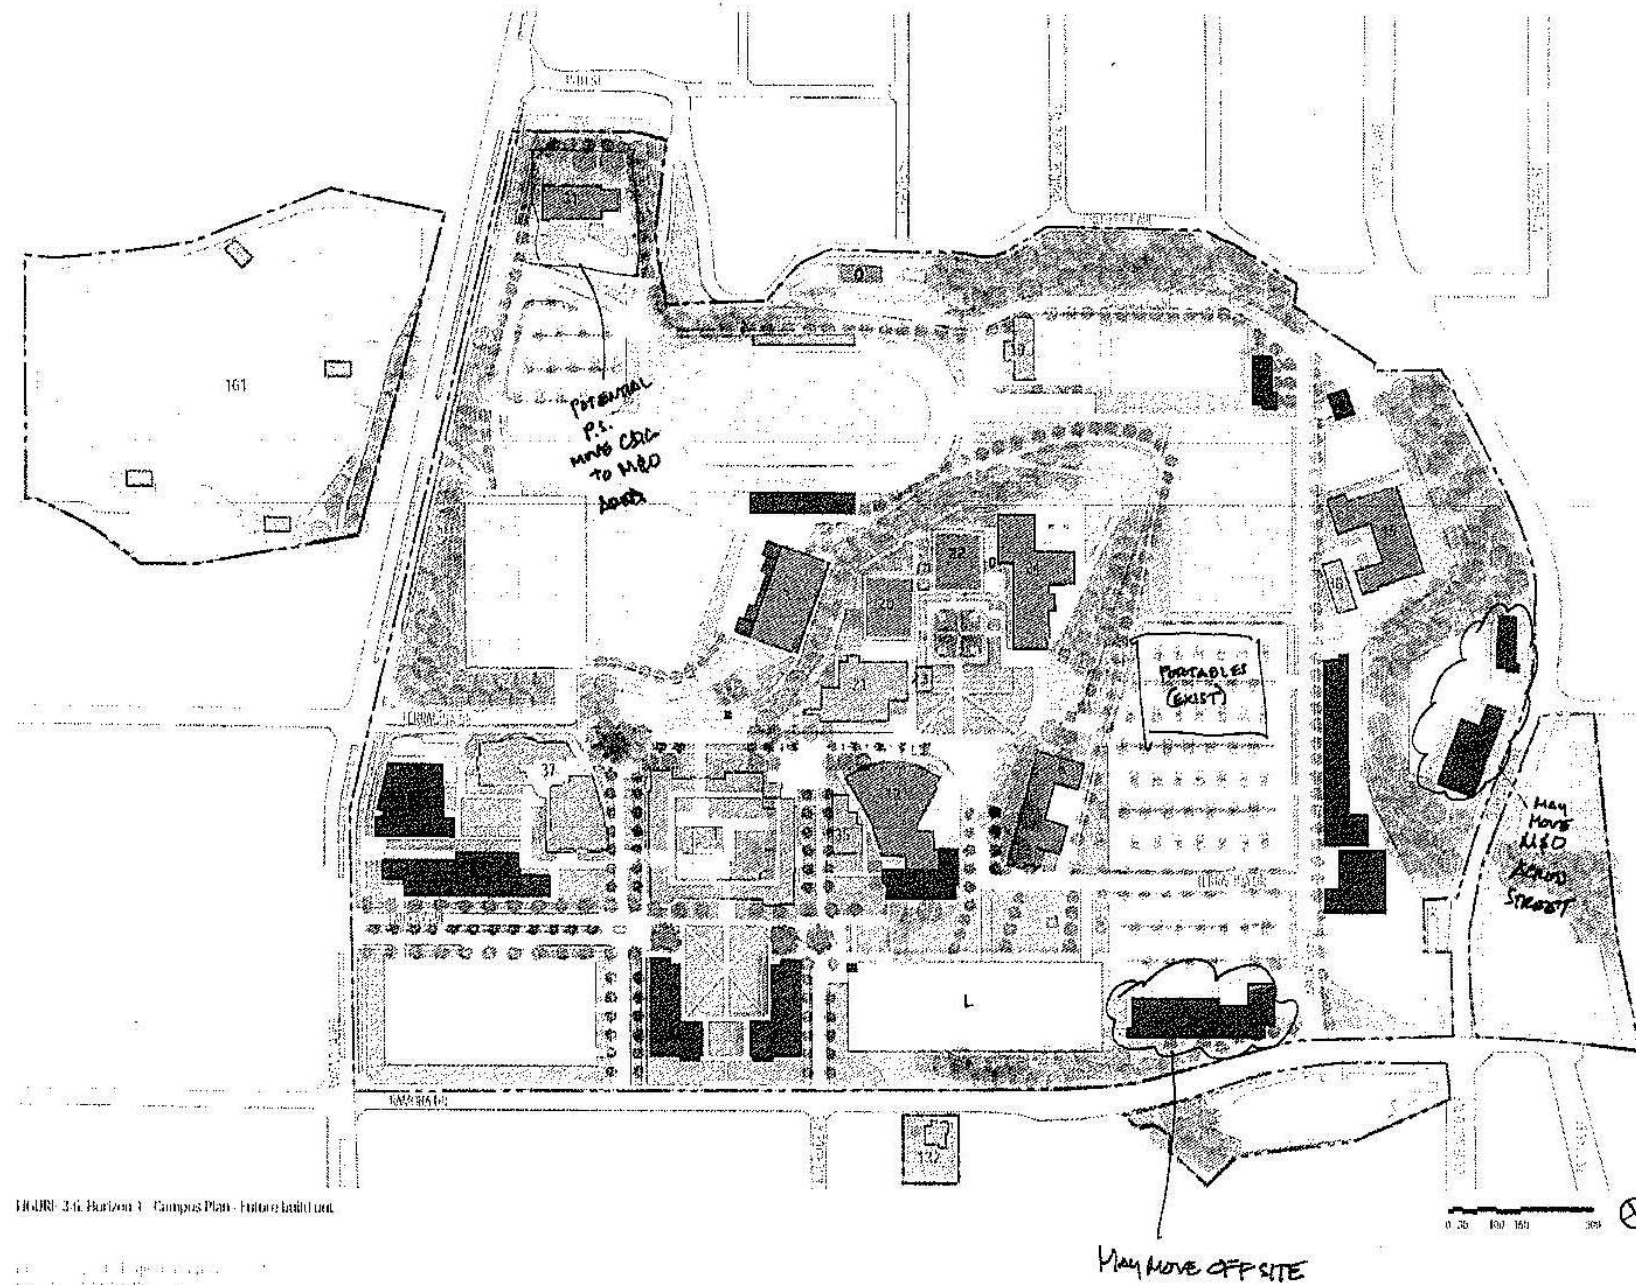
Horizon 1 - Campus Plan - Future Label List
